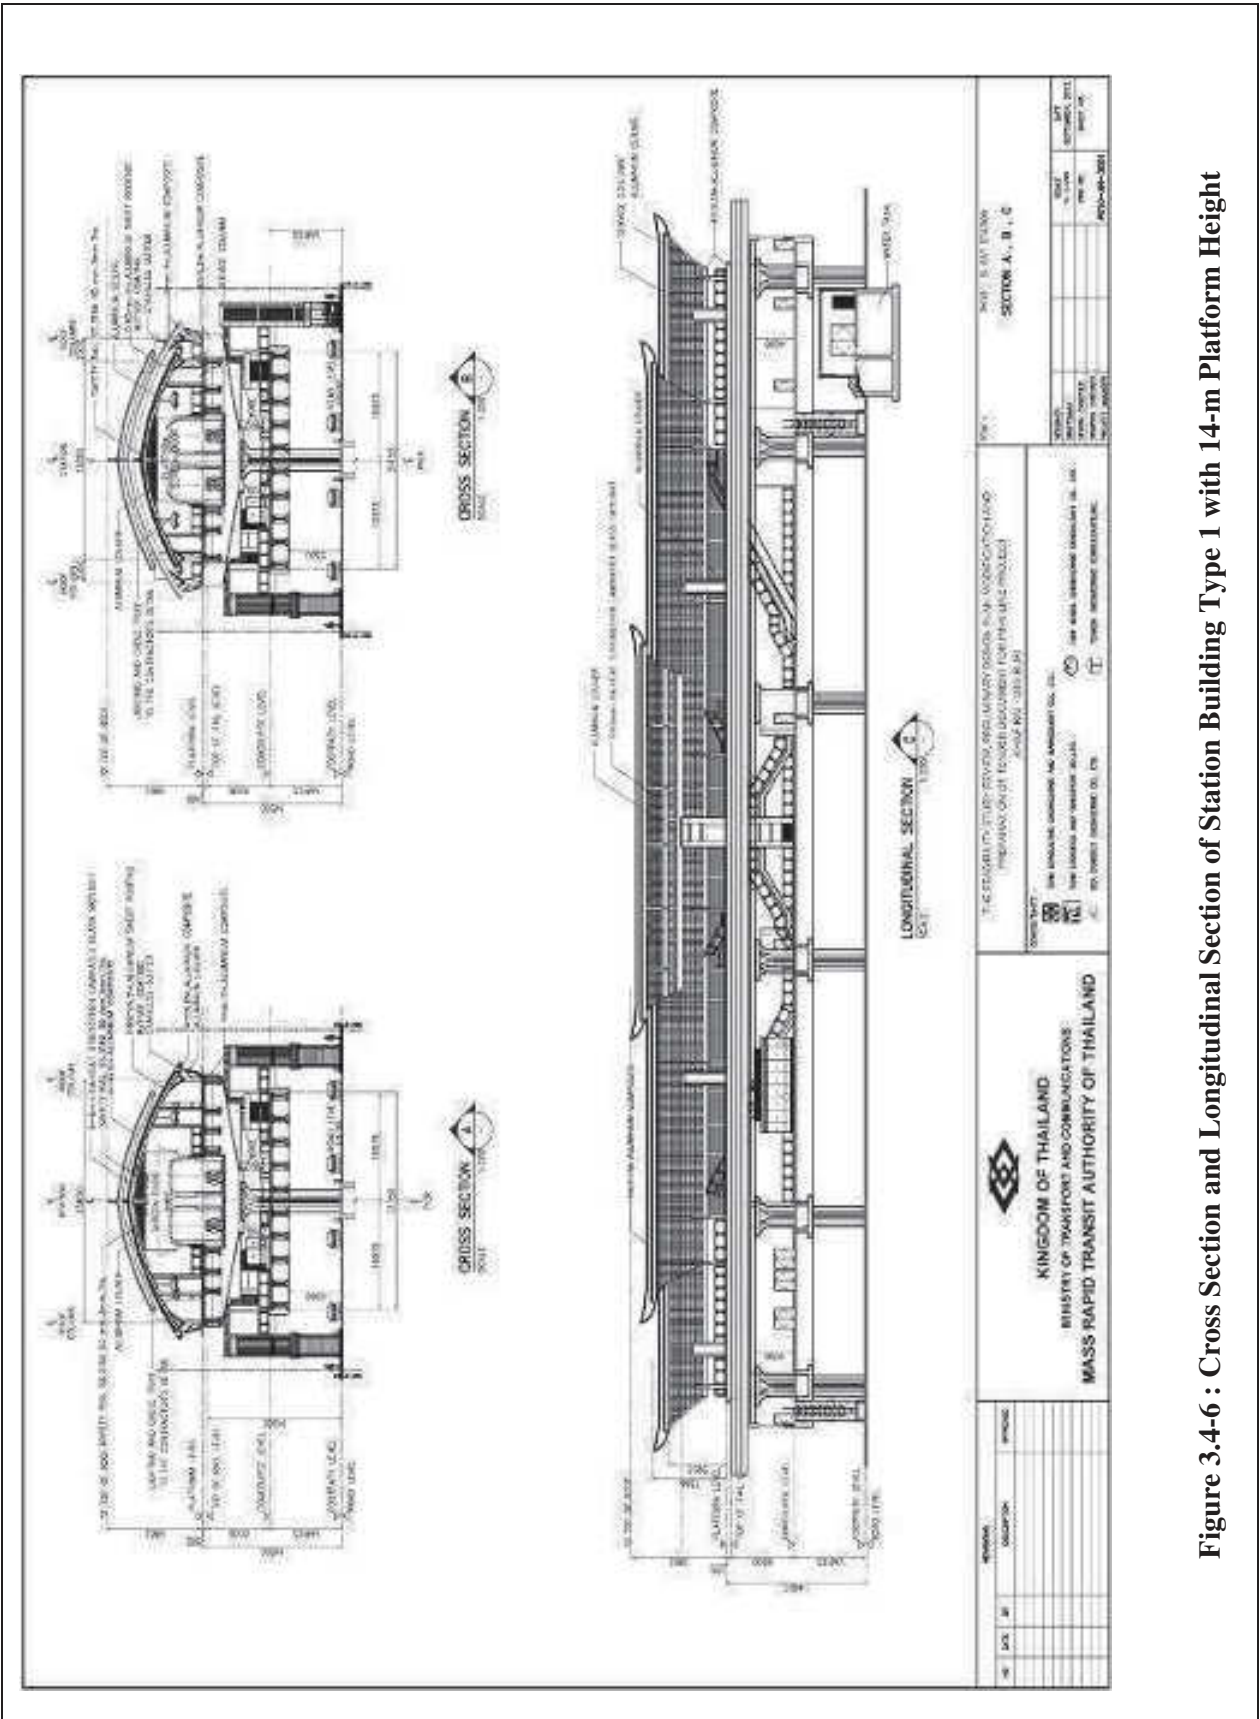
Cross Section and Longitudinal Section of Station Building Type 1 with 14-m Platform Height
